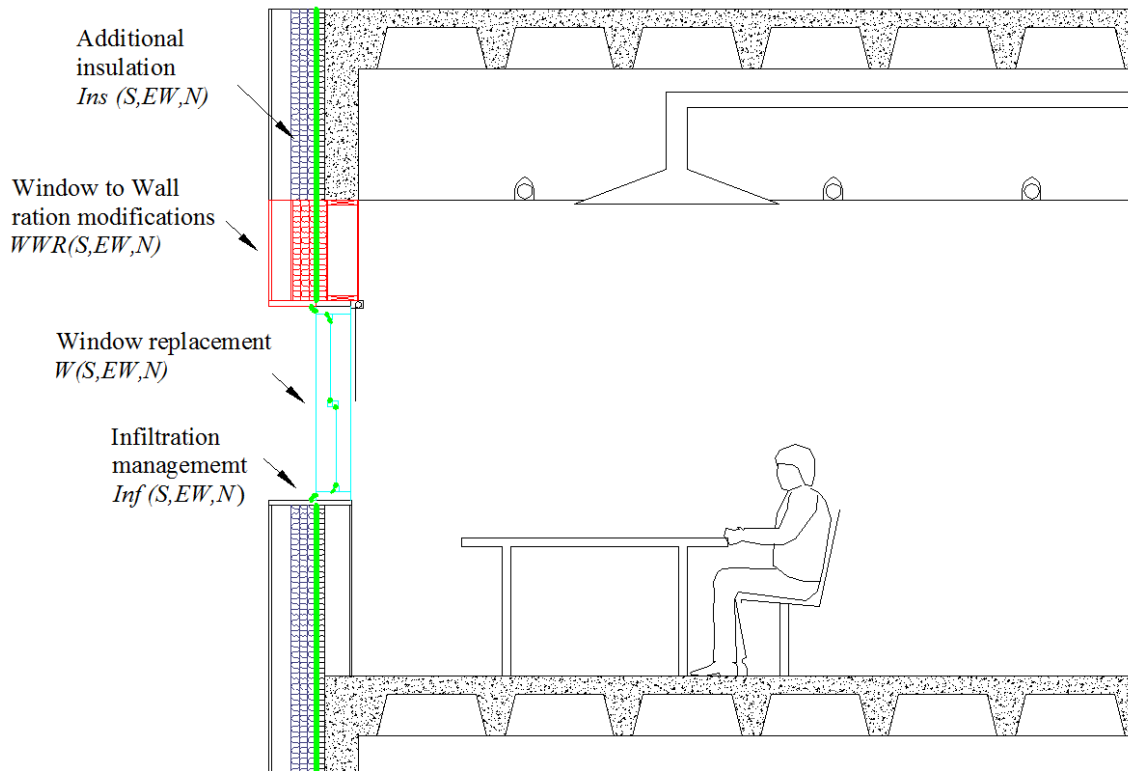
Façade retrofit measures with the case names used in Section 4.3.
